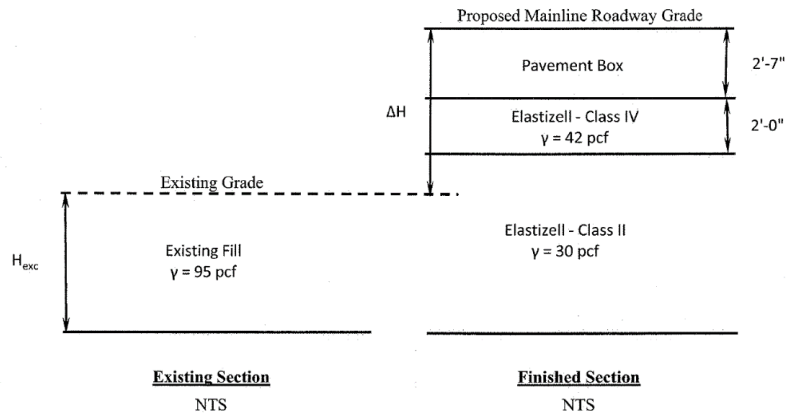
Example schematic of the compensating fill design alternative using lightweight foamed concrete.
